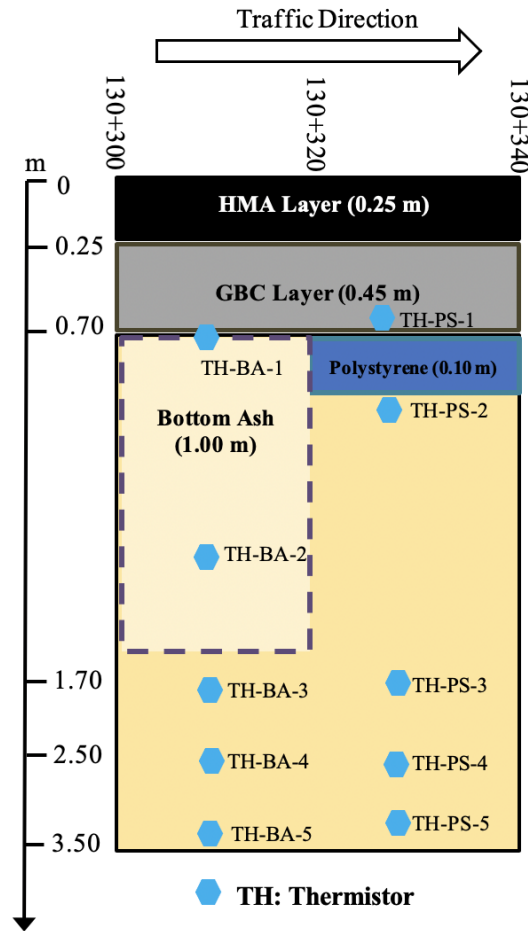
Schematic illustration of the pavement cross-section at the IRRF test road for test sections containing BA and PS insulation layers
